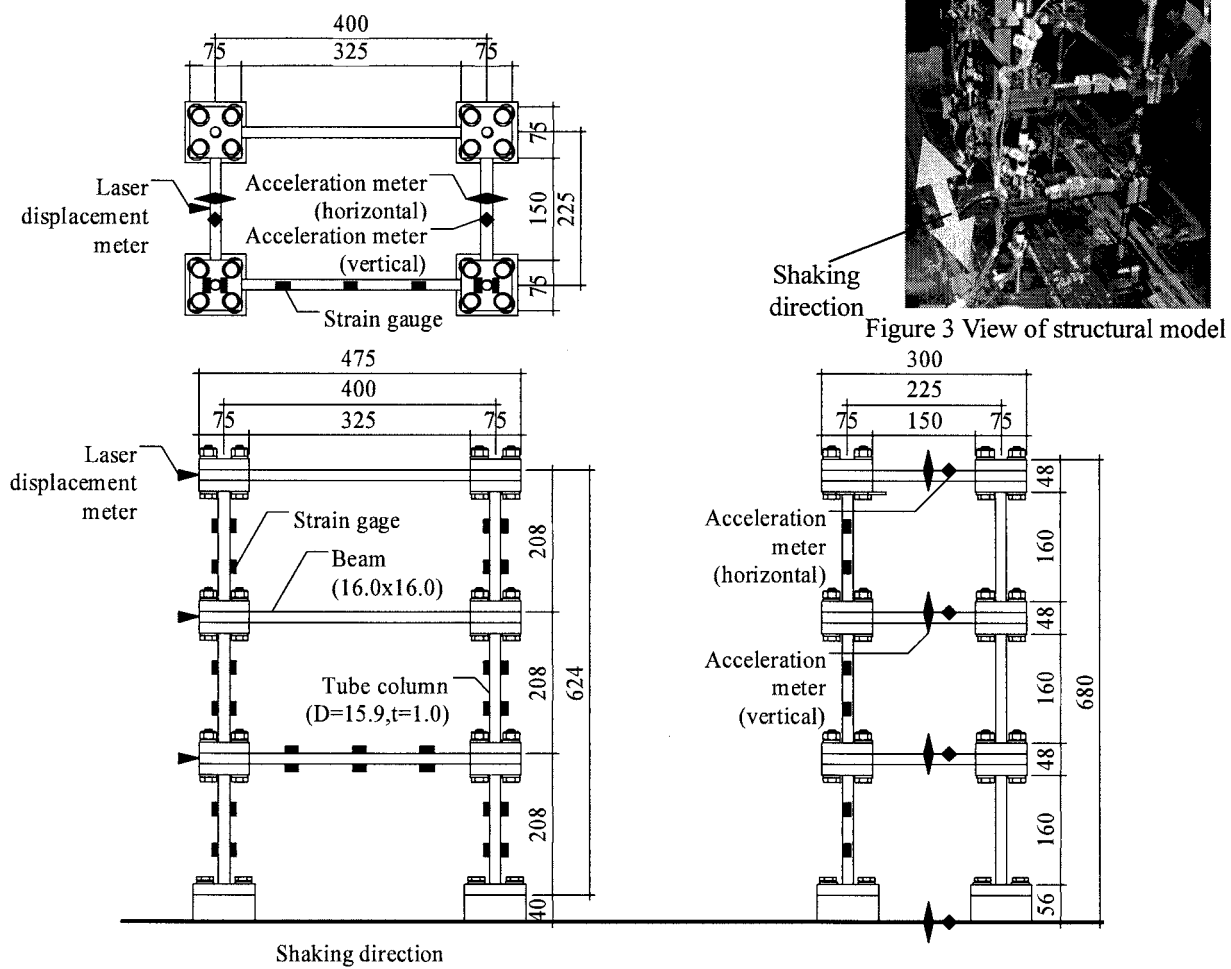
Elevations and plan of structural model [Dimensions in mm]
